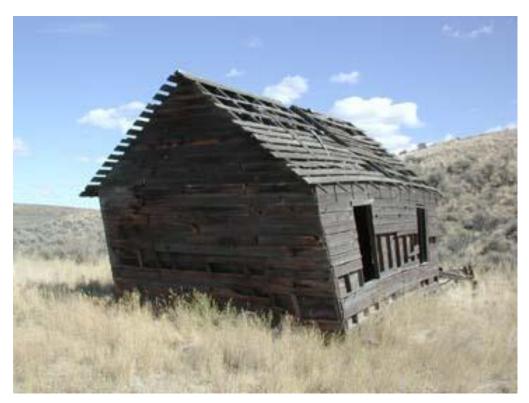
Structure located in NW1/4 of Sec. XX, T. XX N., R. XX E., W.M. (view to East)
